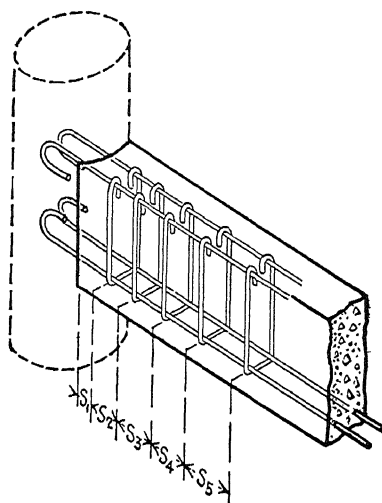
Typical Reinforced Concrete Beam with Anchored Longitudinal Bars and Vertical Stirrups.
